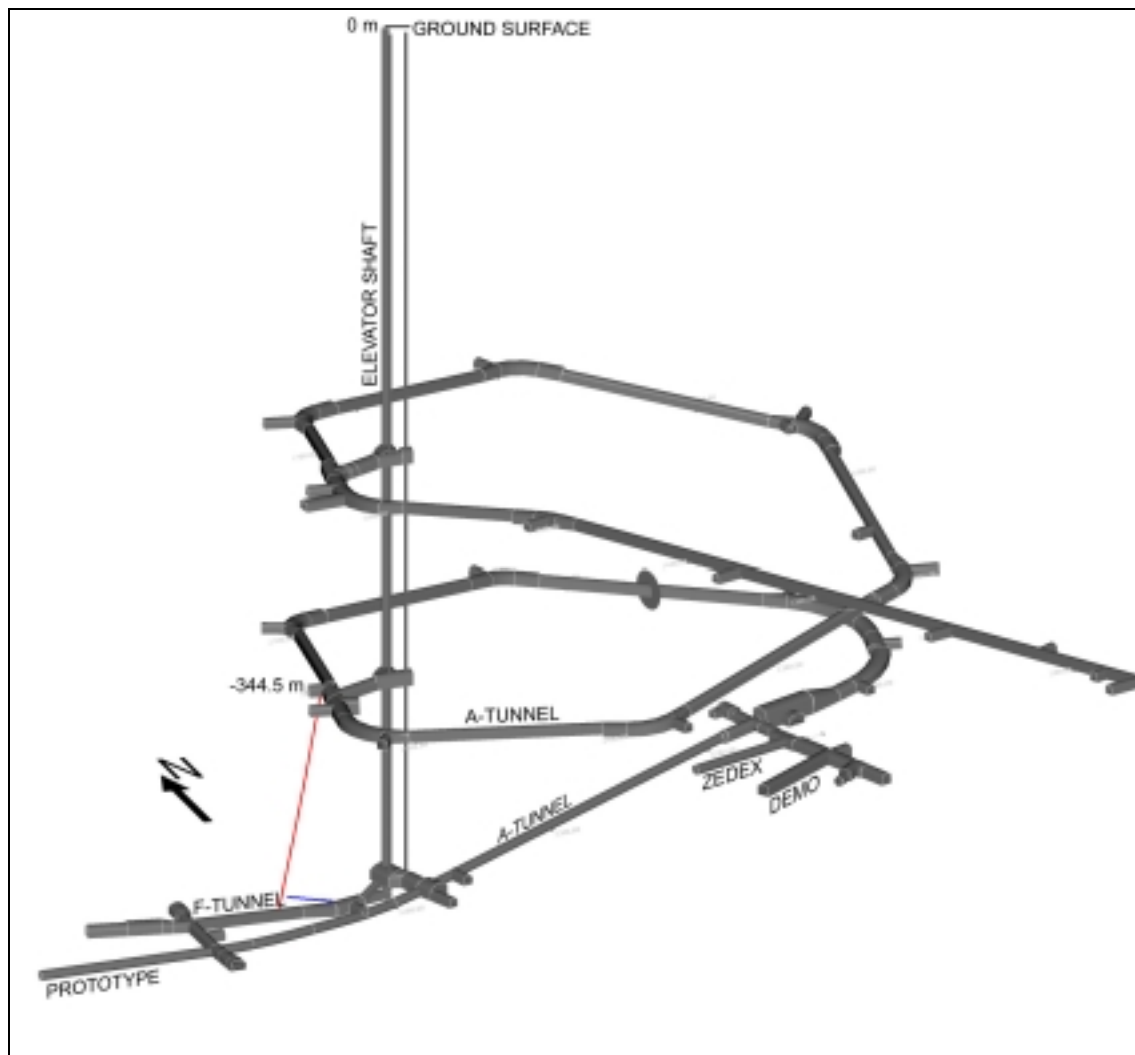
View of Äspö HRL from SSW, the test location is placed north of the F-tunnel.
